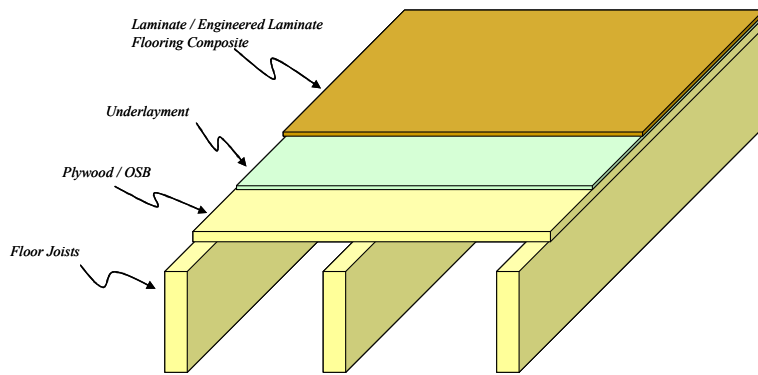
(a): Laminate and engineered flooring with underlayment on wood frame construction
